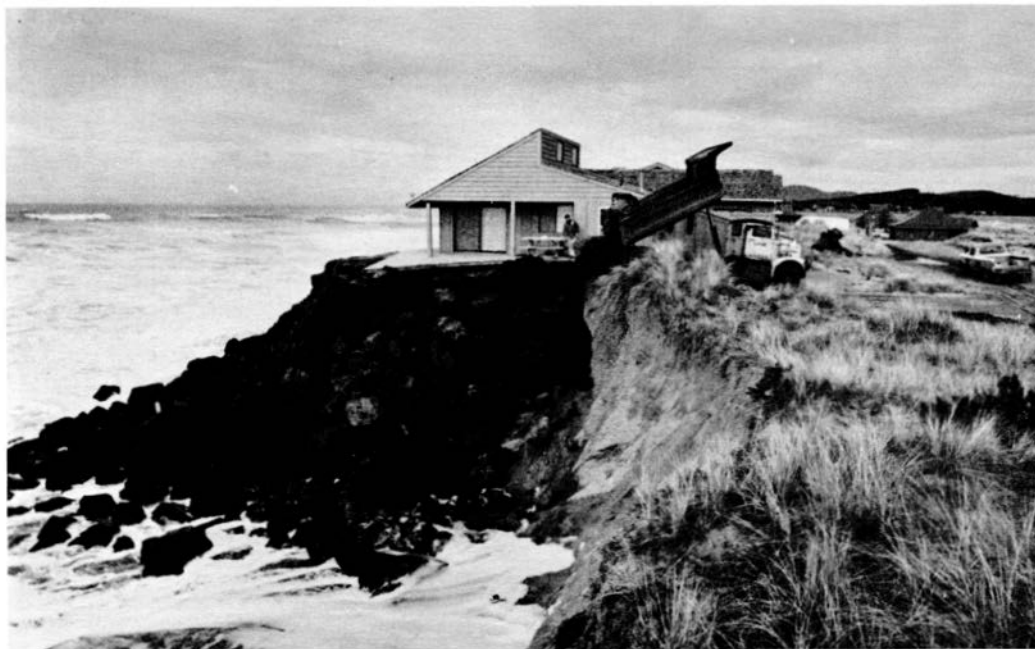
Same house as above after continued storms in January 1973 gouged out sand beyond the terminous of the riprap. Waves have already removed some of the basalt chunks used for riprap. See Photo 84, page 134, showing additional 1973 erosion.
